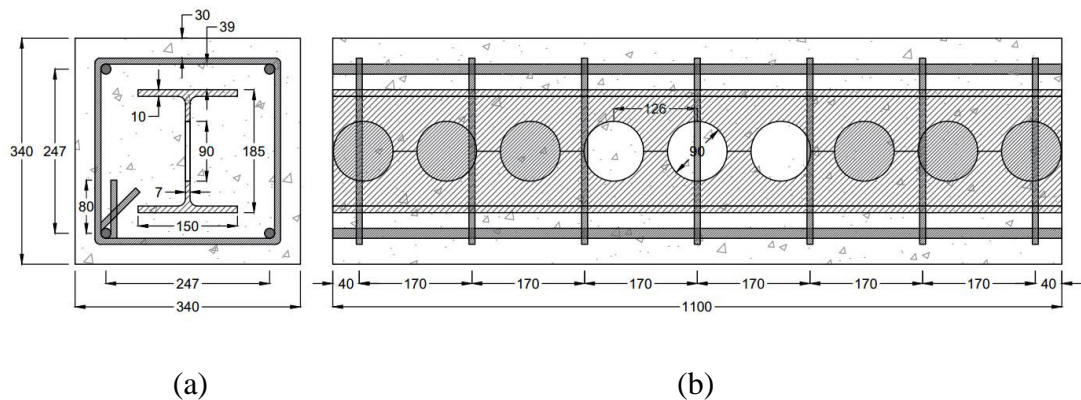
Reinforcement details of C1-170 (A) and C1-170 (B) columns;
